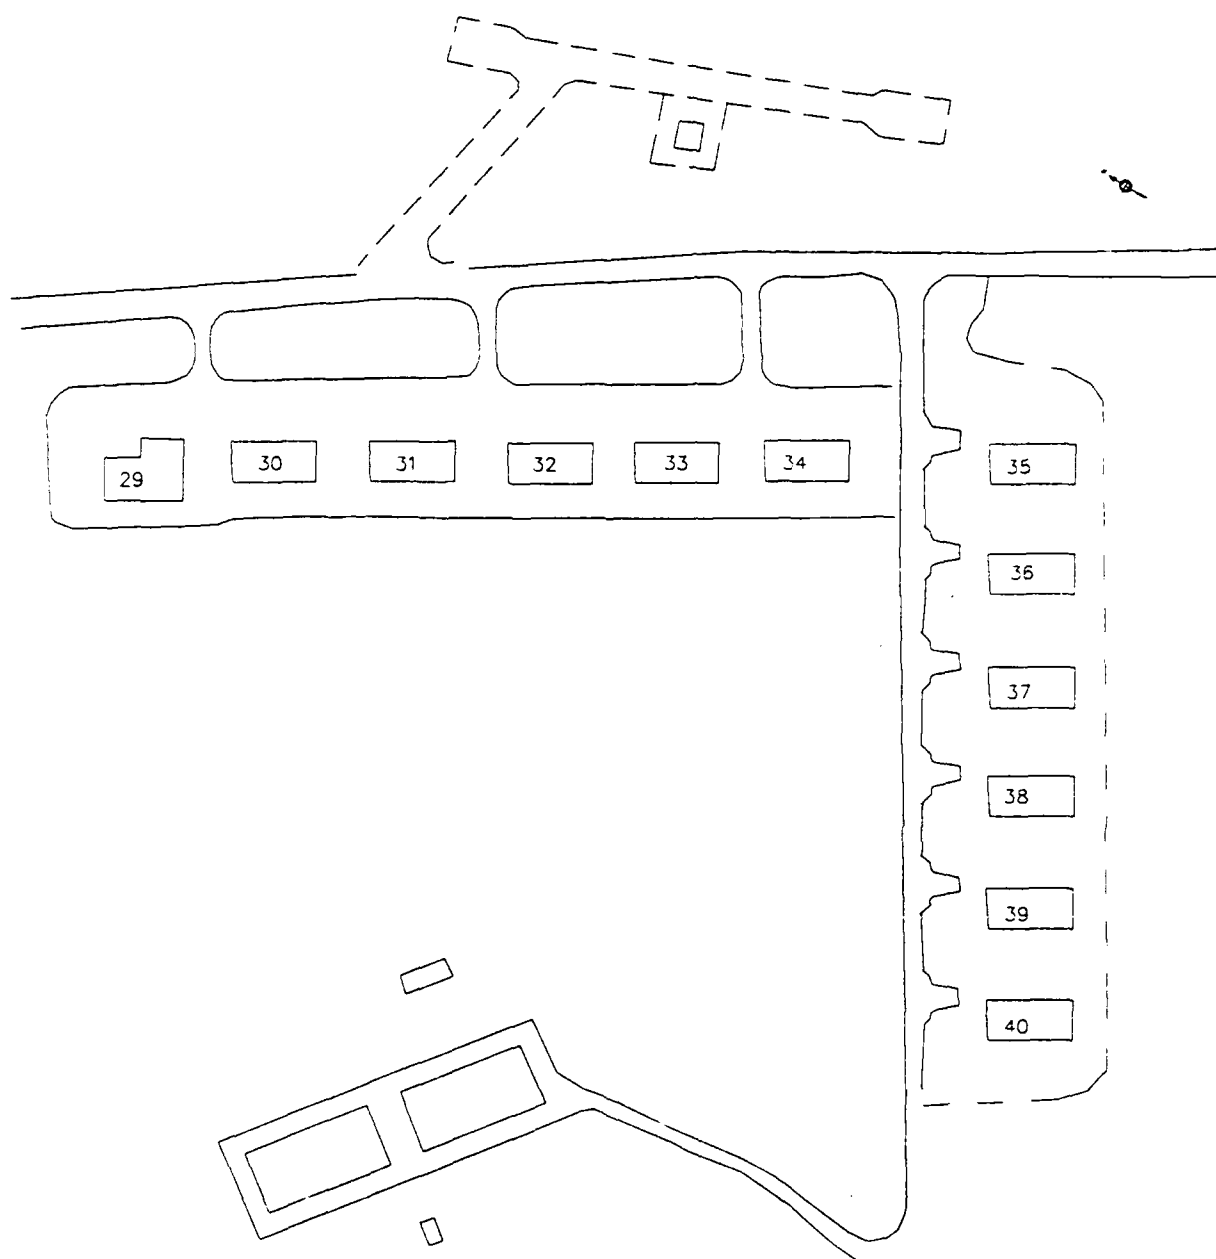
Site Plan Map of Monroeville Army Housing Units
